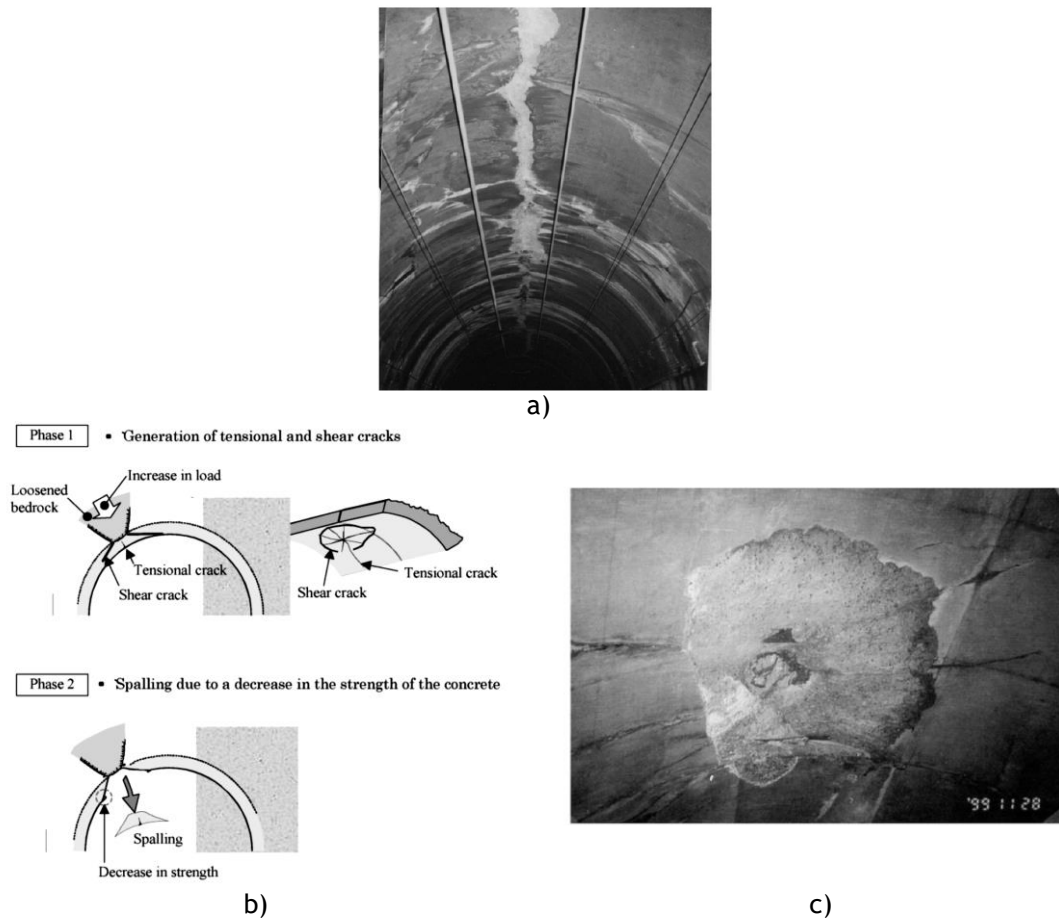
a) Compressive failure in the Tukayama tunnel, b) spalling Mechanism in the Rebunhama tunnel and c) Lining of the Rebunhama Tunnel after spalling, Japan [29].
